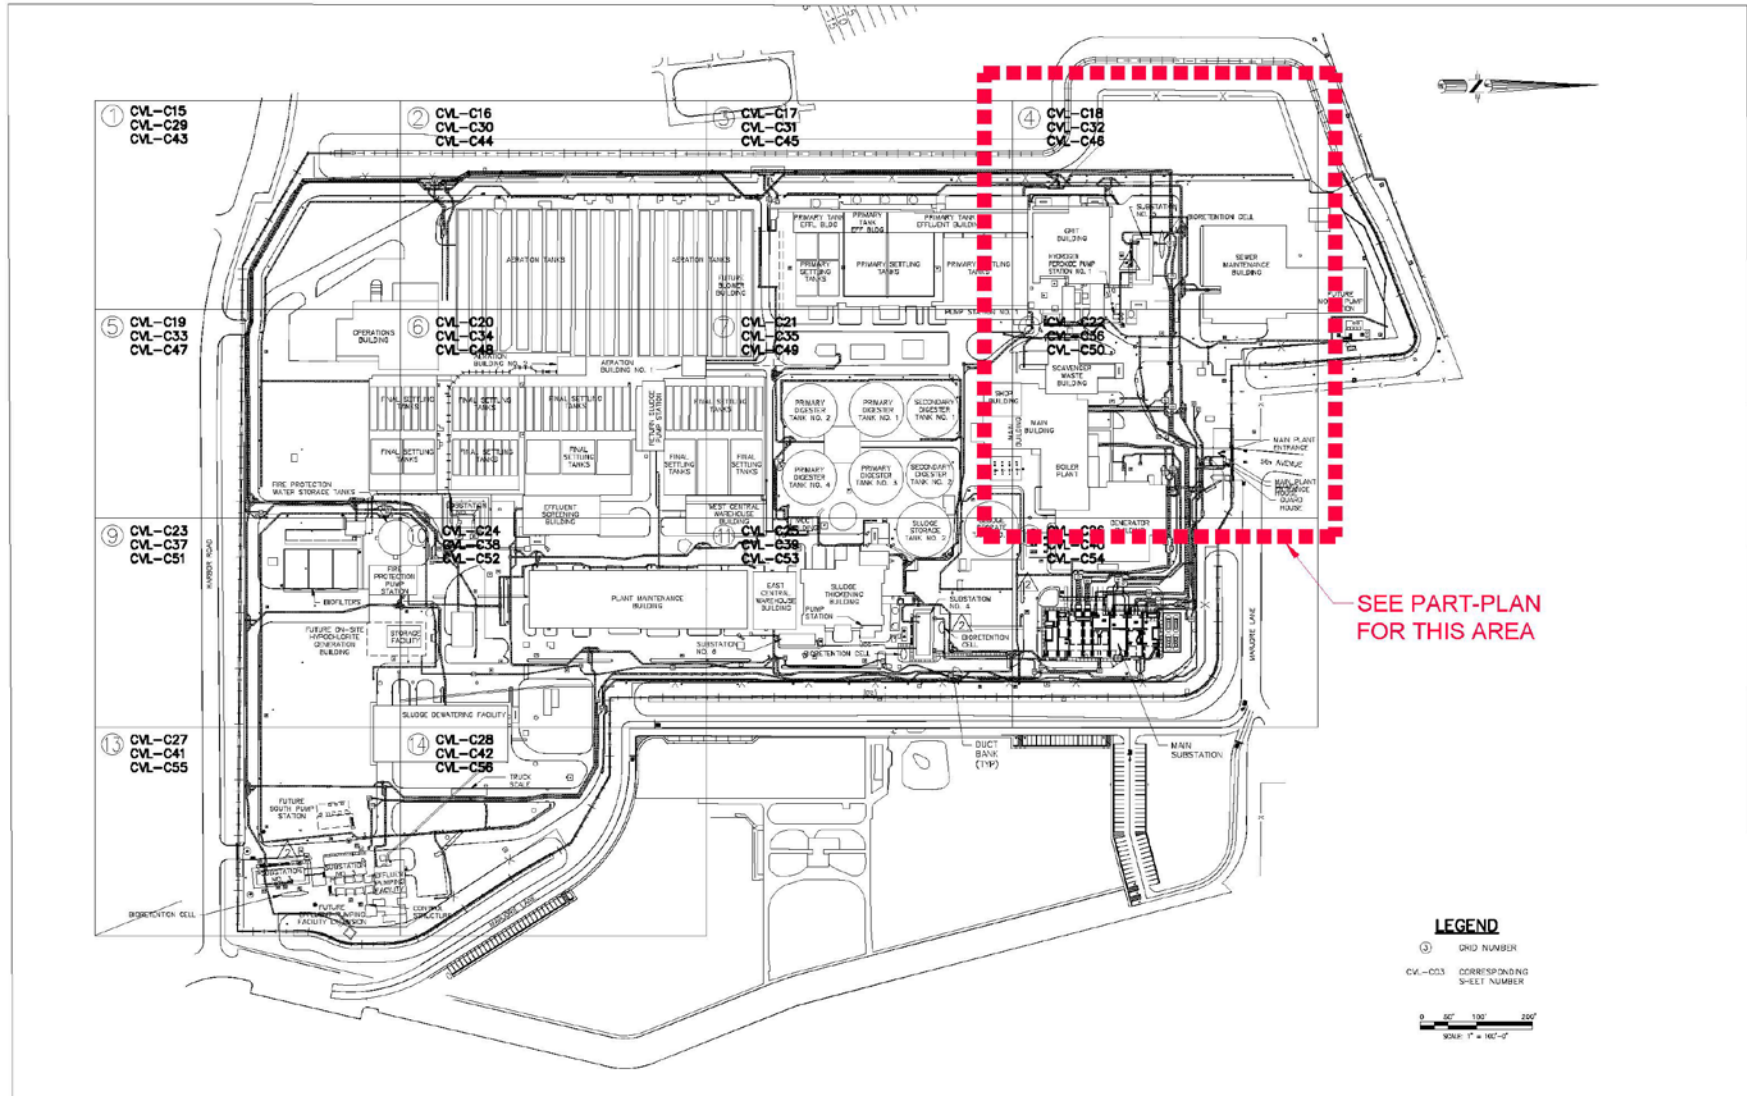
Bay Park STP Electrical Infrastructure- MG Part Plan
